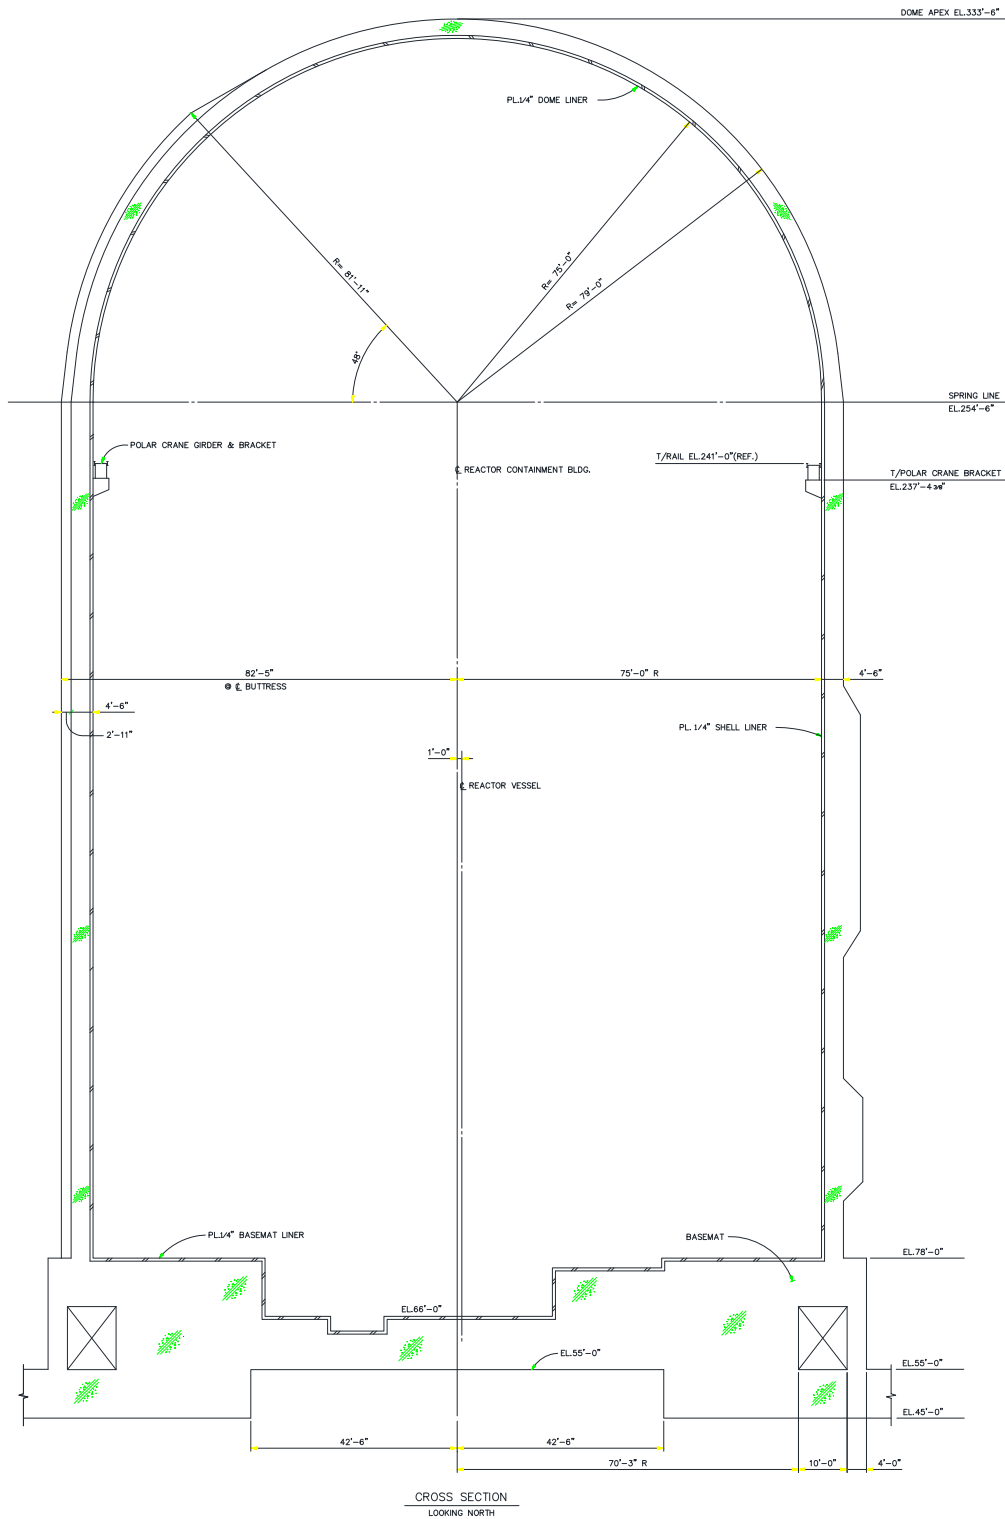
Typical Section of Containment Structures (Looking North)
